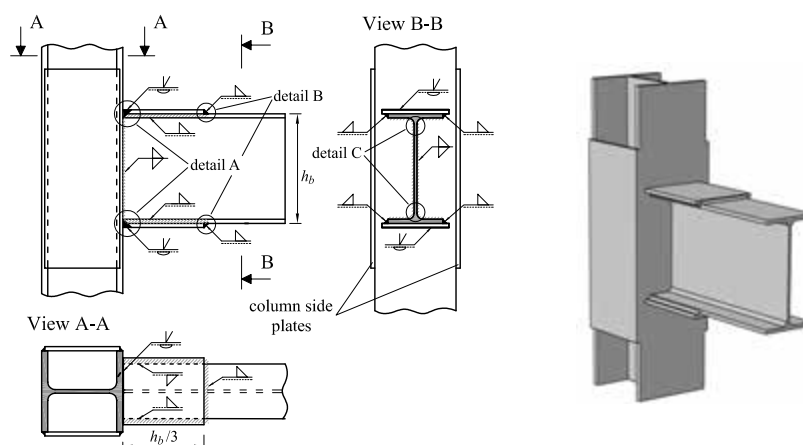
Welded CP beam-to-column joint details (concrete column encasement not illustrated)
